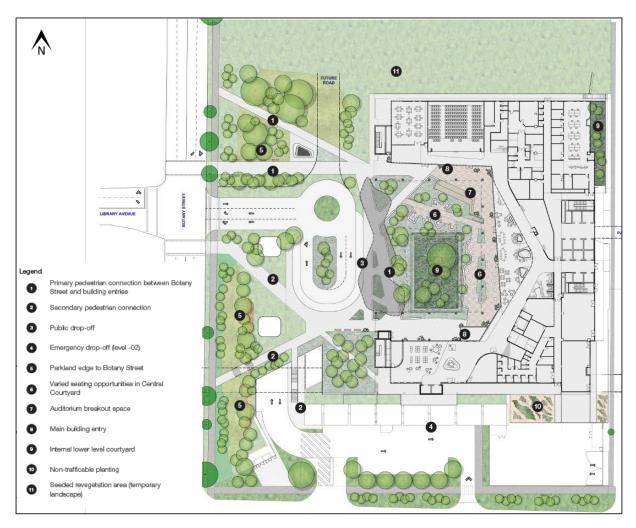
| Landscape concept - Levels -02 and -01 (Source: EIS)
